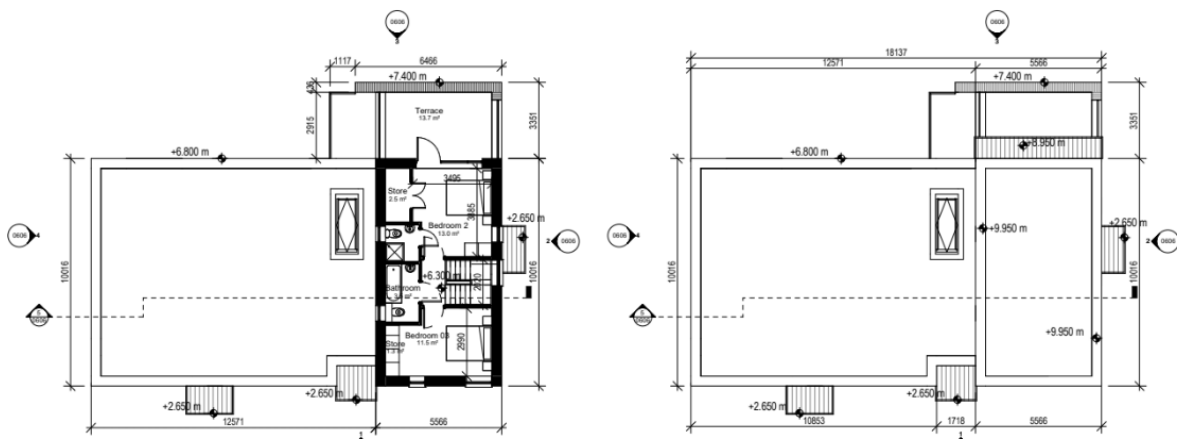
Proposed second (left) and roof (right) plans of Duplex Block Type R
